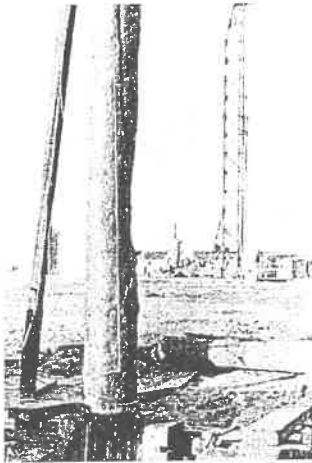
Test pile Amsterdam extracted for inspection. Note the Vibro-rig in background and slender pile section at location of first batch, cast through the reinforcement cage.
